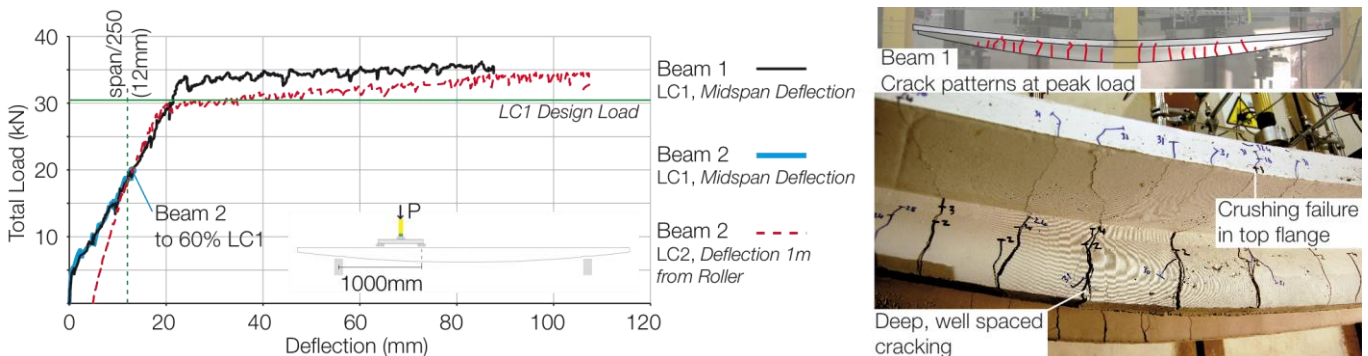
Load-deflection results for Beam 1 and Beam 2 in LC1 and LC2 (l); Cracking at failure, Beam 1 (r).
